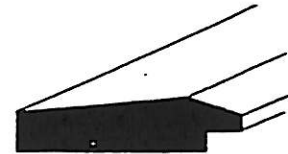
Moulding Dimensions (Freshman Framer, 1978)
